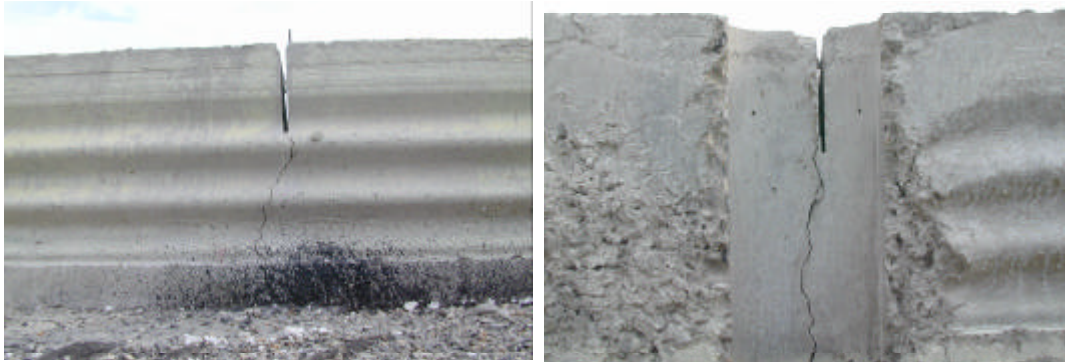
Shrinkage cracks under sawn transverse joints.
